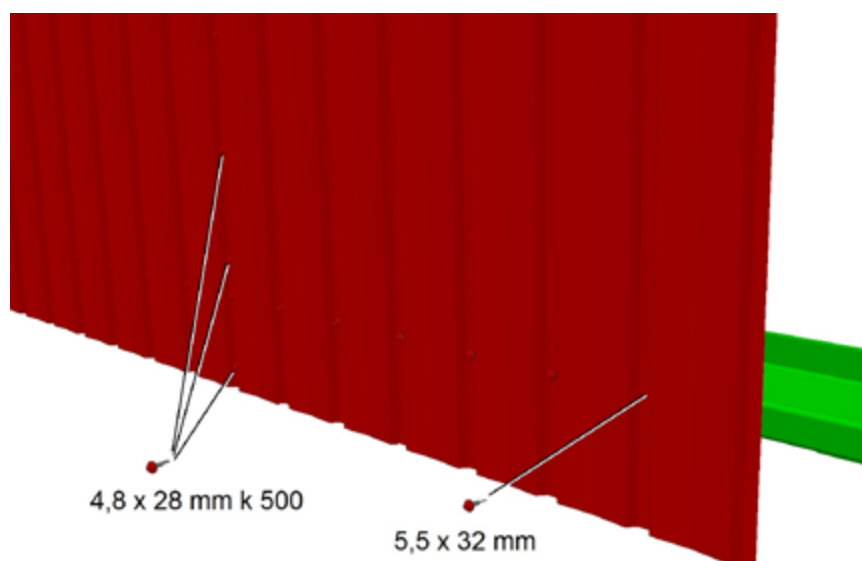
W-15/1134 attachment to steel purlin and lateral overlap screwing.
